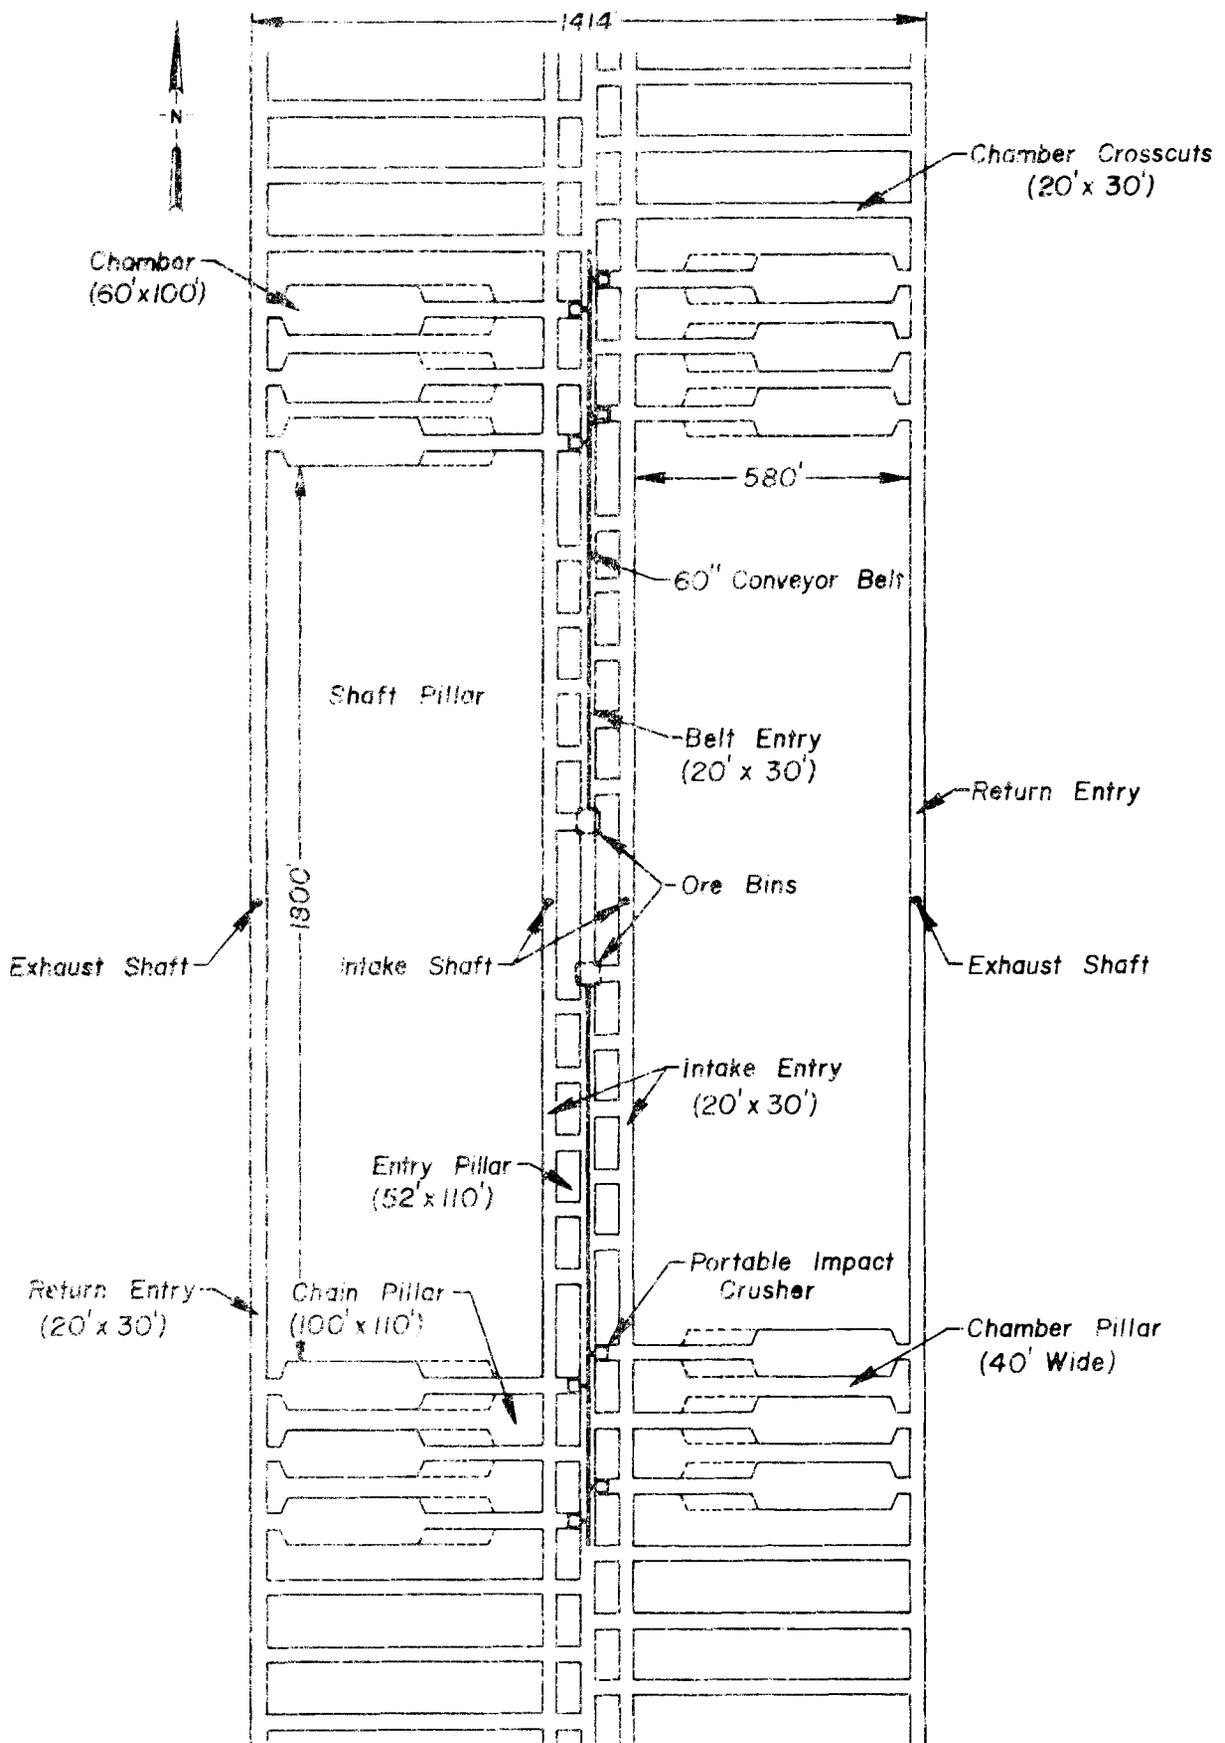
Plan View of Production Layout, Chamber and Pillar Mining
